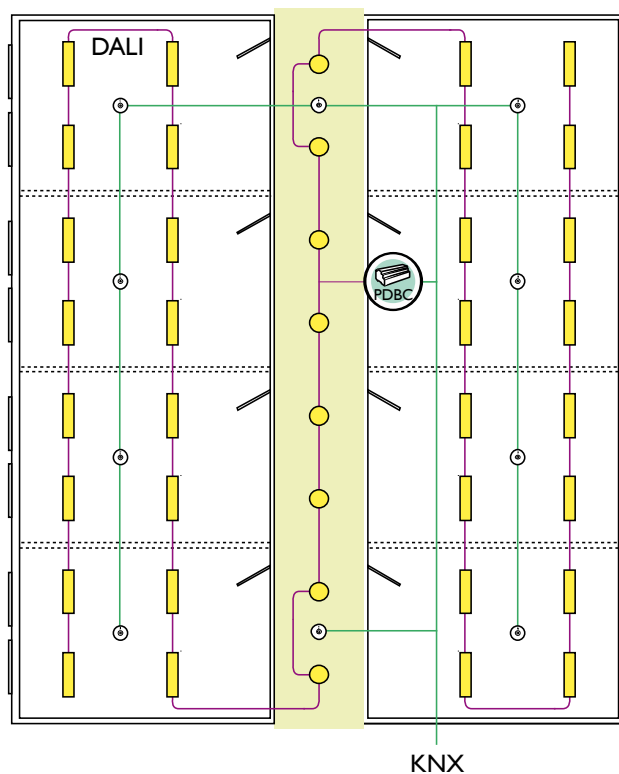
Example enclosed office layout using layout with DALI multi-master and KNX sensors
